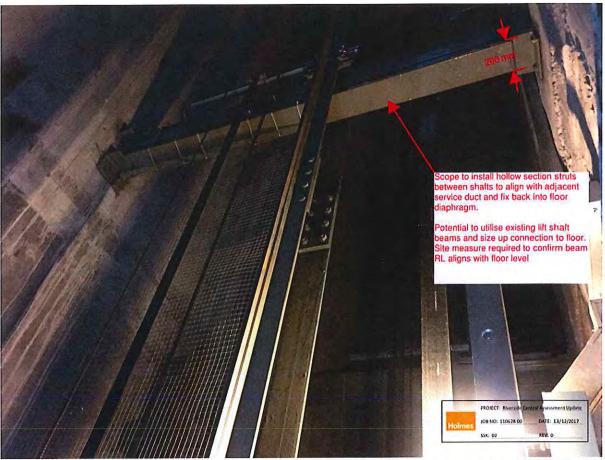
Level 5 looking across lift shaft showing existing structure and availability of space between lifts for potential strengthening
